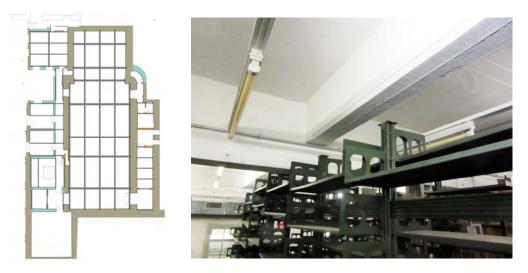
The structural frame of the new reinforced concrete slab built in the early decades of the 20th century to obtain the library storage and reading room above (left) and a photograph of the main beams (right).
